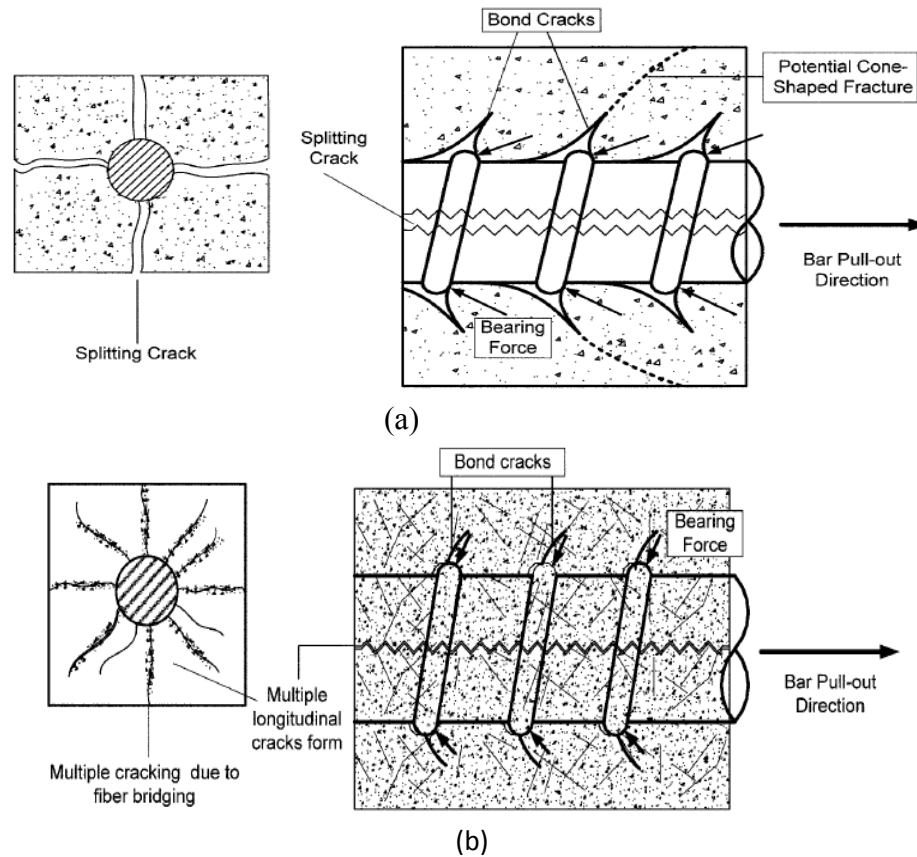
Bond mechanisms in (a) reinforced concrete and (b) SFRC (adapted from Chao et al., 2009)
